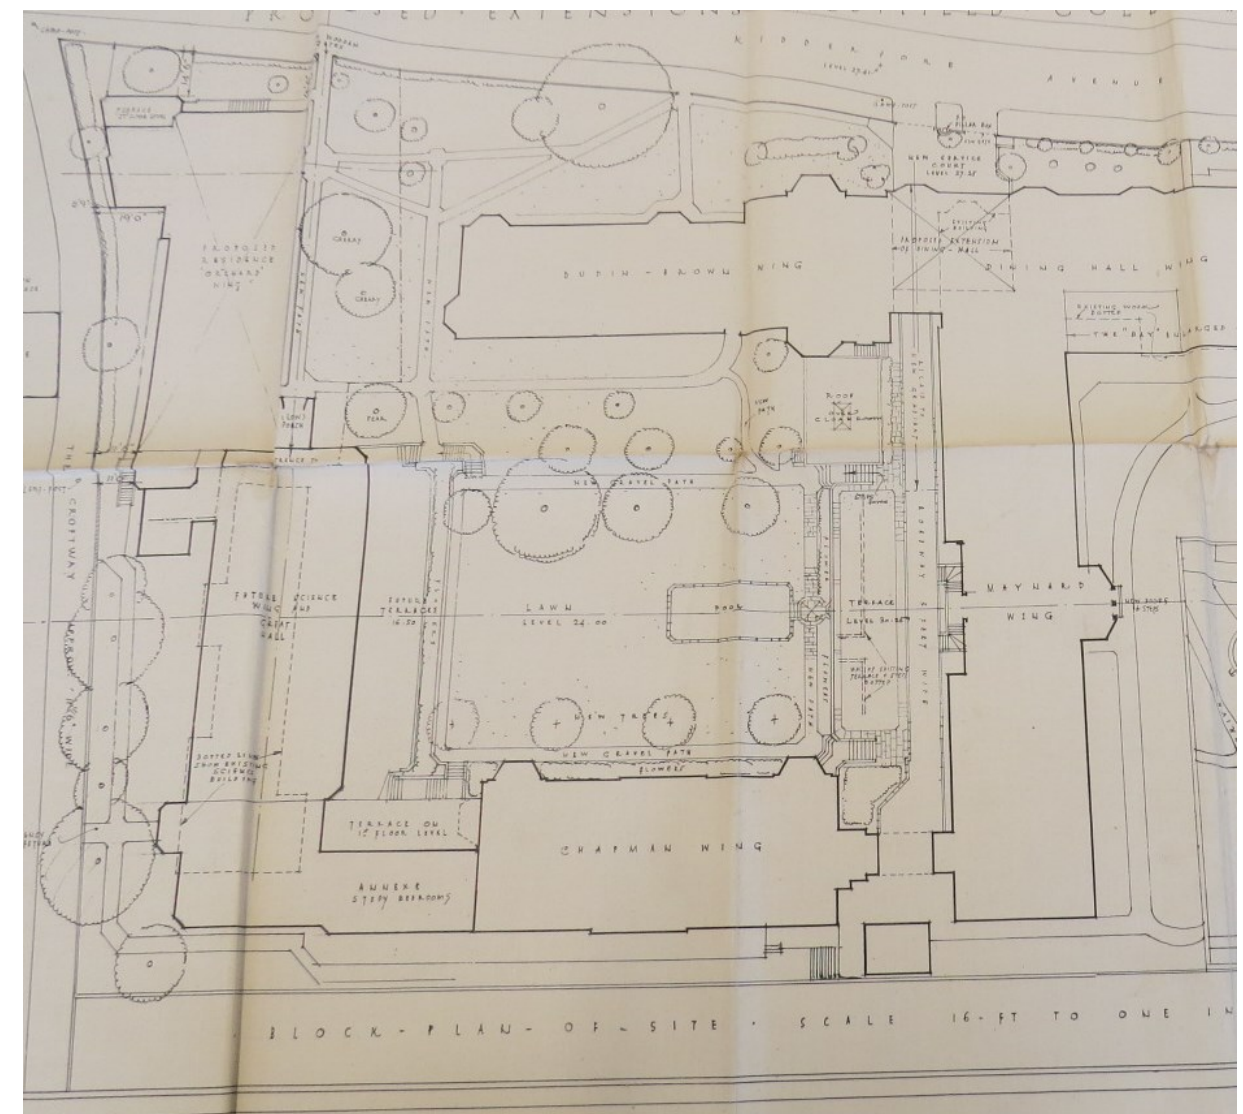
The site plan drawn for the 'Proposed extensions – Westfield College' in 1934 for Lord Cameron Hall. The proposed new science wing in the location of Rosalind Franklin Hall can be seen to the left of the site plan.
